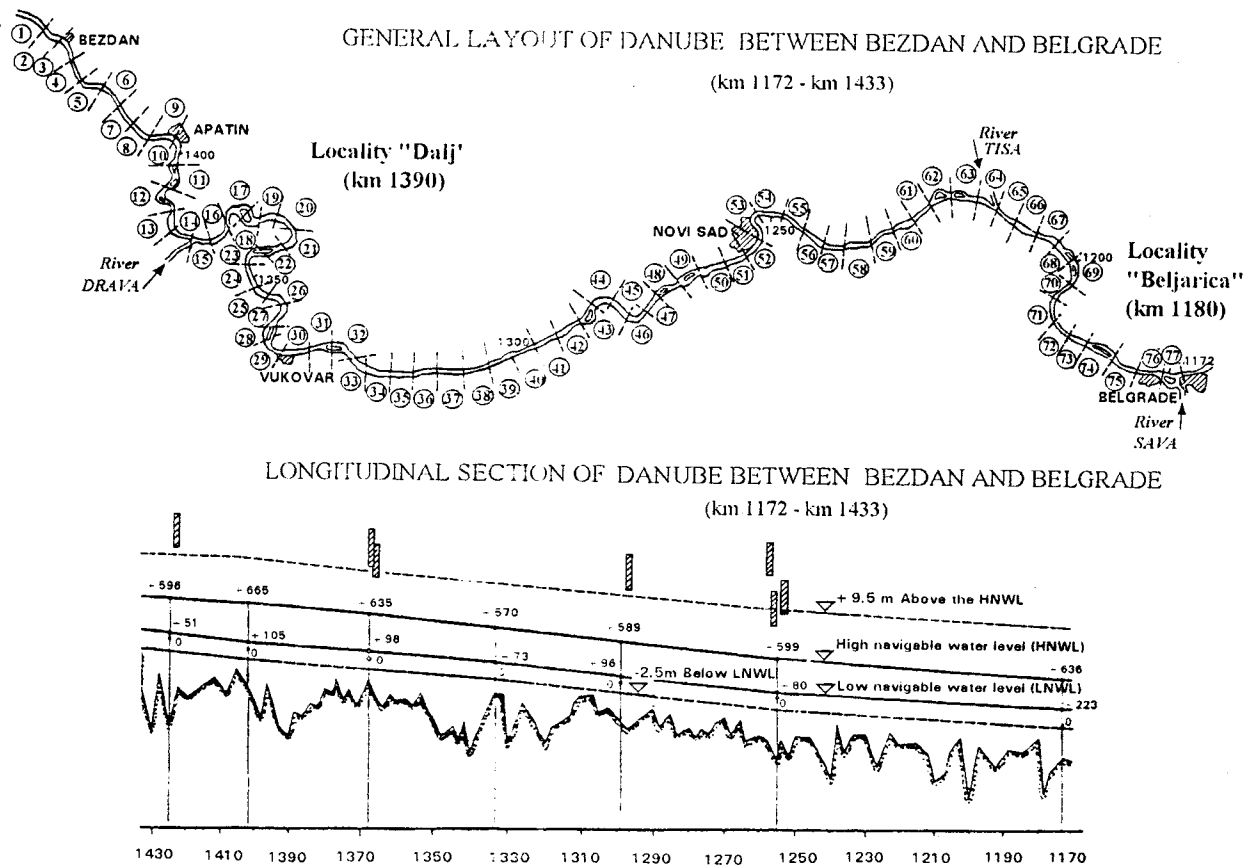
Layout and longitudinal cross-section of the considered reach of the river Danube between Bezdan and Belgrade
